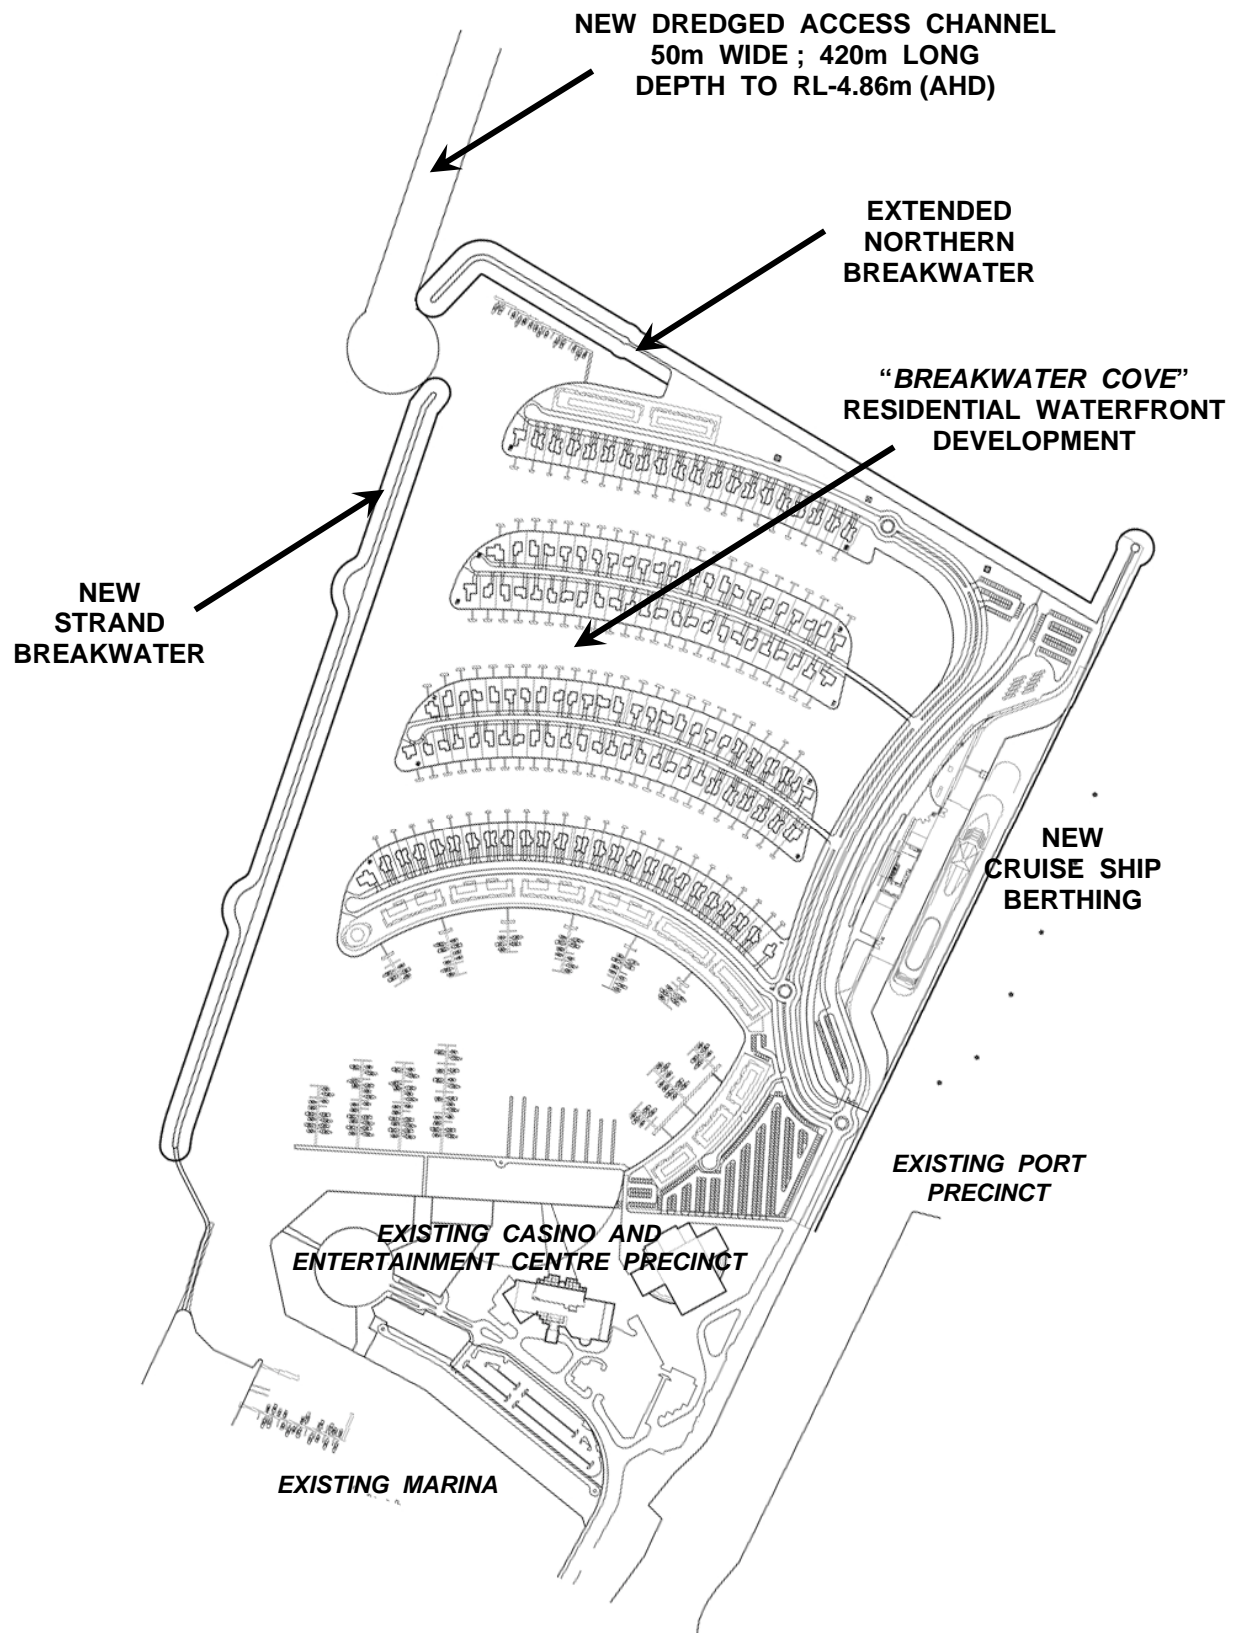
Layout of the Proposed Townsville Ocean Terminal Project
